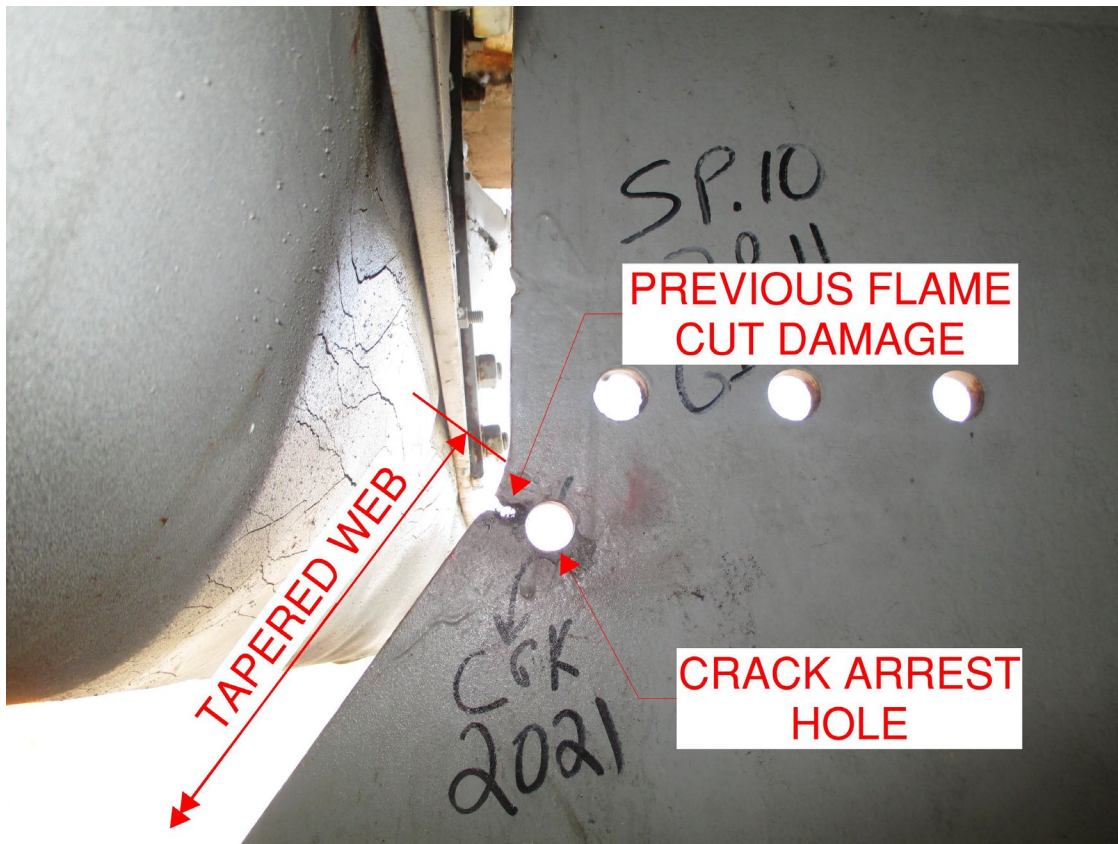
Photo of Crack Location with crack arrest hole drilled at tip of crack.
